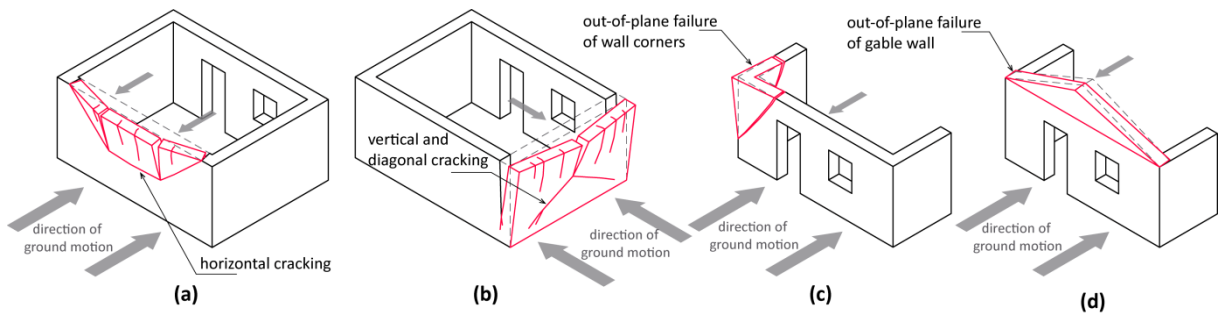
(a) Out-of-plane mechanism in long walls (AIS 2005); (b) out-of-plane mechanism in short walls (AIS 2005); (c) out-of-plane collapse of the corner; and (d) out-of-plane collapse of the gable
